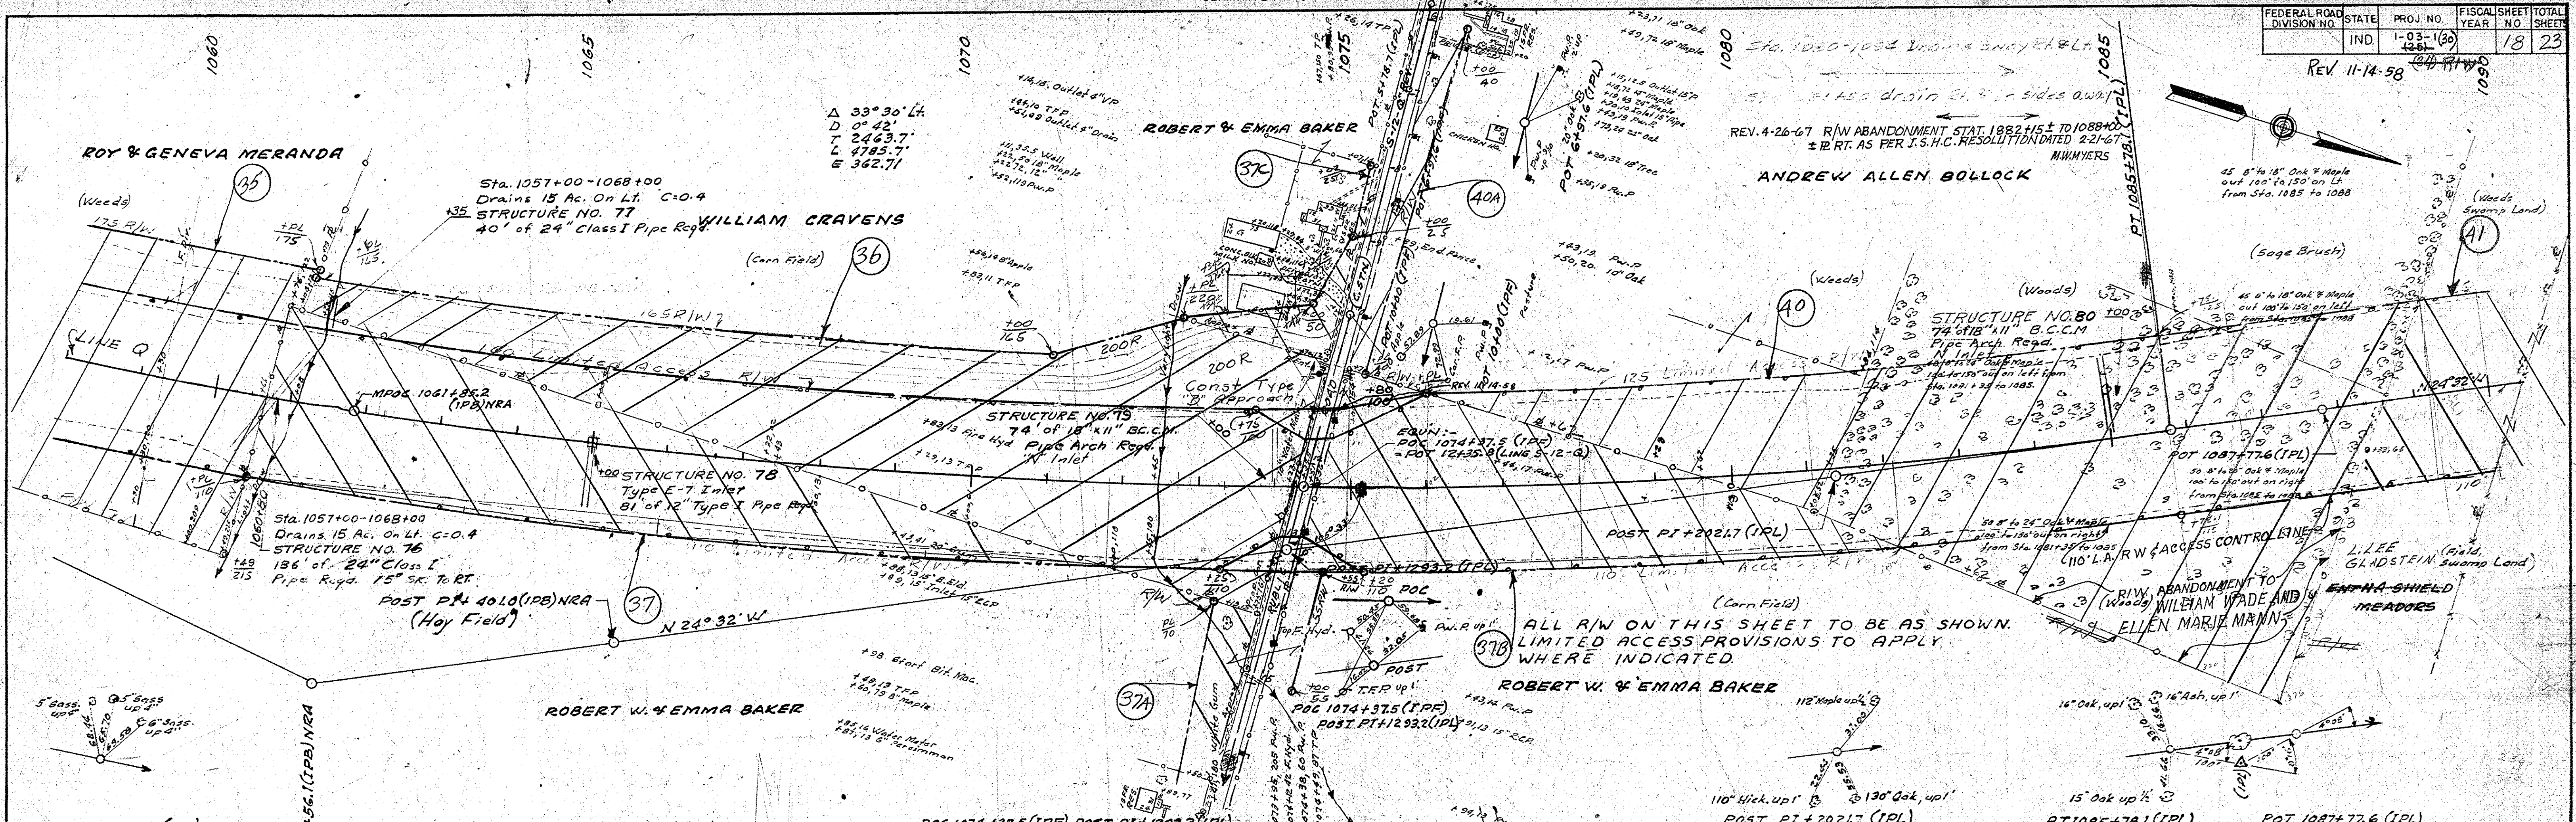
PLAN - PROFILE O. P. & R. E. STANDARD
